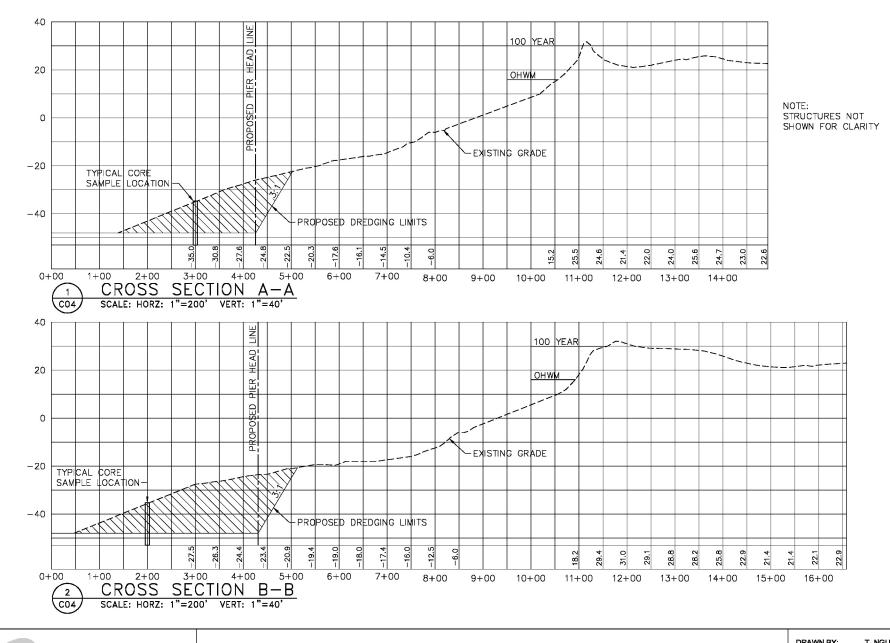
Port of Vancouver Columbia Gateway Detail Plan
